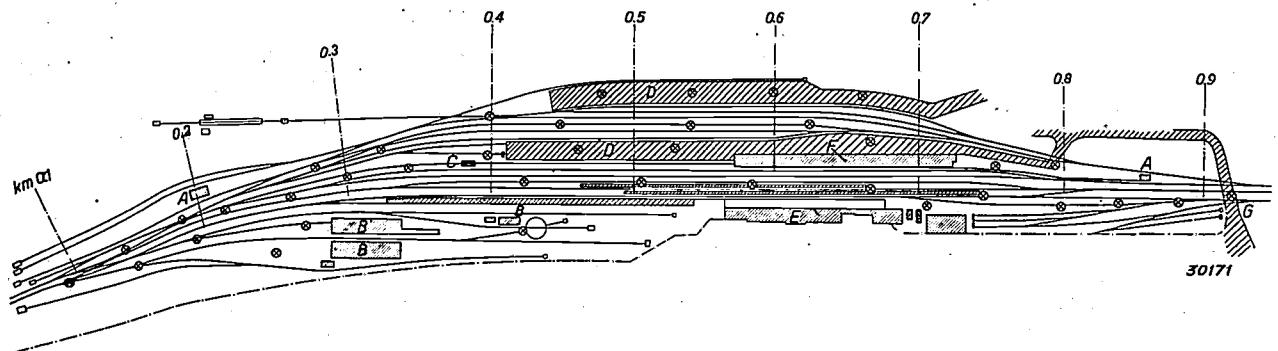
Ground plan of the railway yard in Breda. A signal box, B work shops, C weighing cabin, D unloading yard, E station building, F goods shed, G level crossing.
